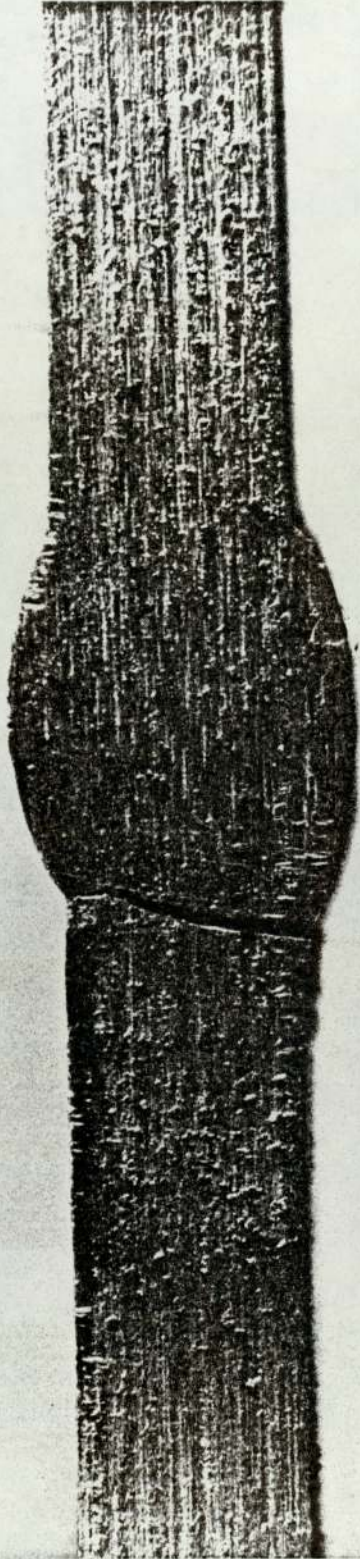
Typical fatigue crack in the welded specimen.
